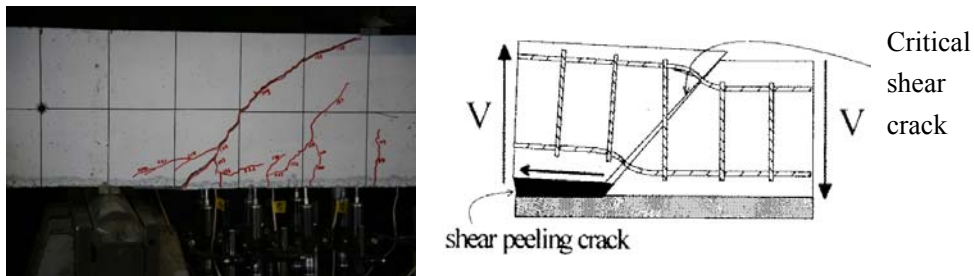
(b) Shear peeling mechanism due to shear crack
